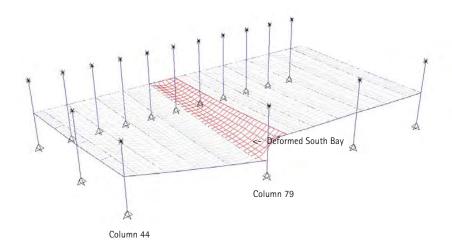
SAP2000 Model under gravity loads with disconnected girder (4x amplified elastic deformation; west slab sections removed from view for clarity) (Note: effect of trench header at south bay not accounted for in approximated deformations)
